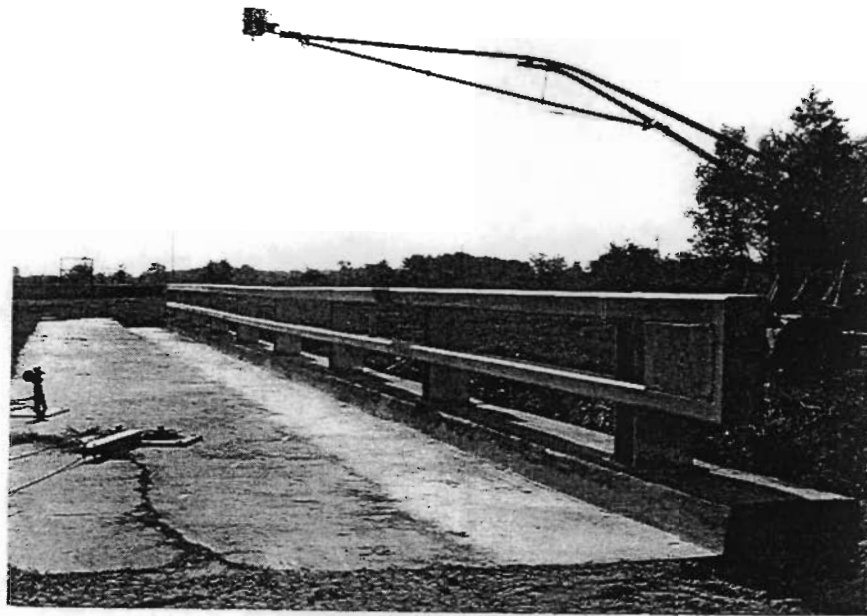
Wyoming TL-4 bridge railing test installation before testing.
